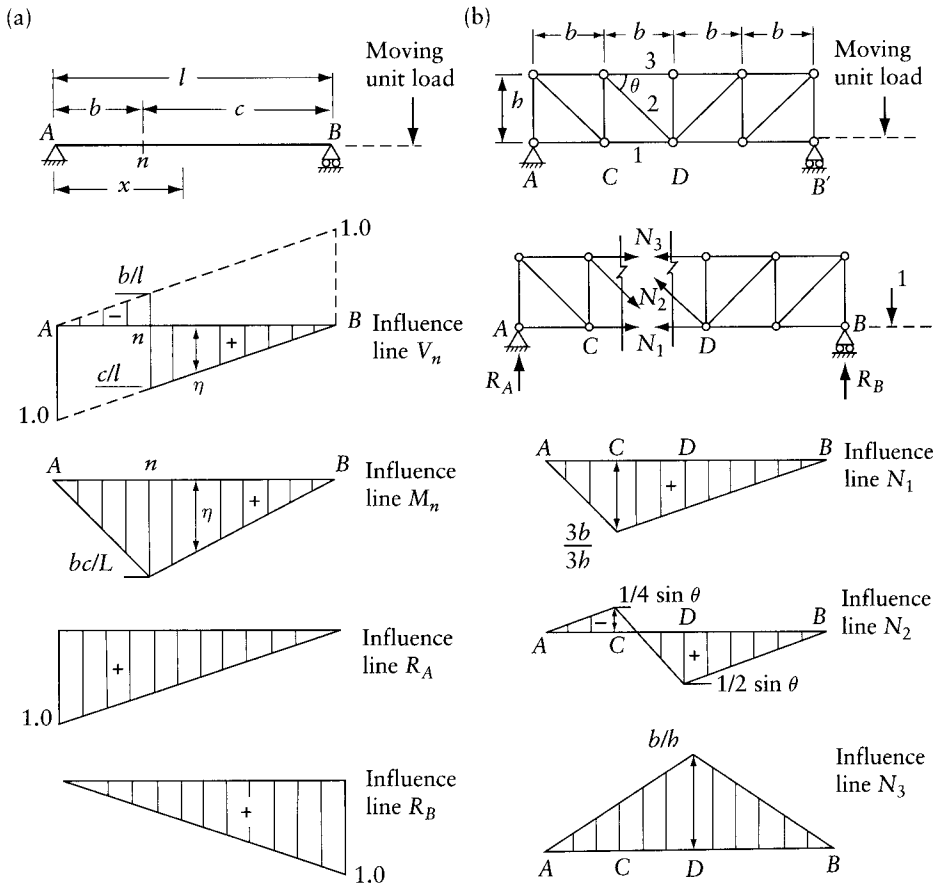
Influence lines for simply-supported structures. (a) Beam. (b) Truss.
